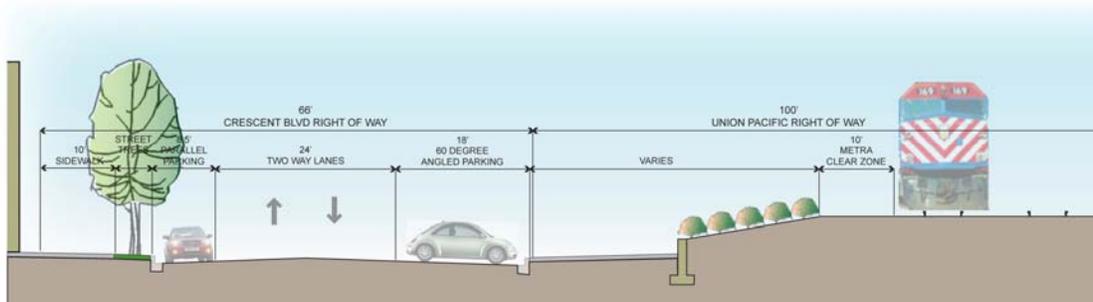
Cross-Section – Crescent Boulevard not Adjacent to a Platform
